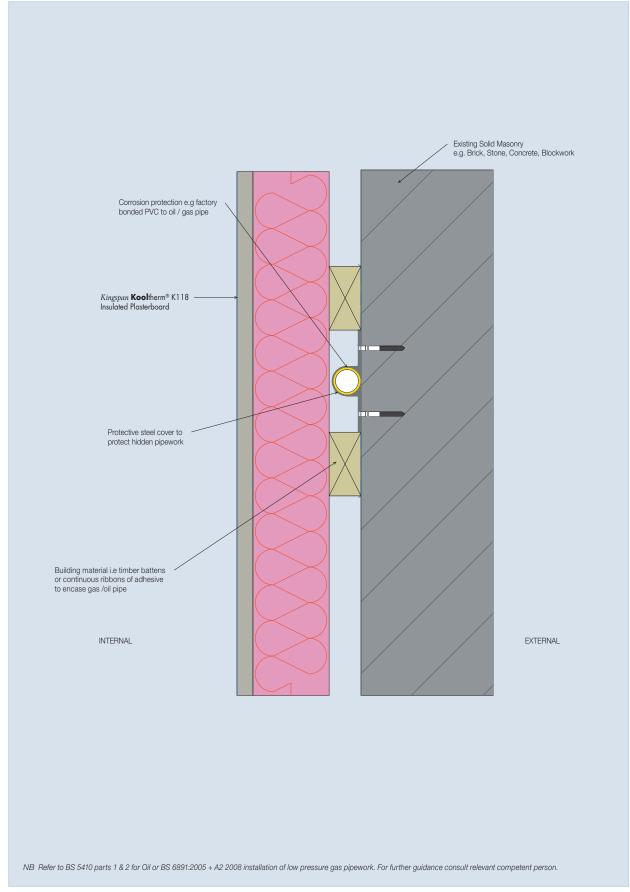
Vertical Gas or Oil Pipe behind Dry Lining Detail (Mechanically Fixed)
